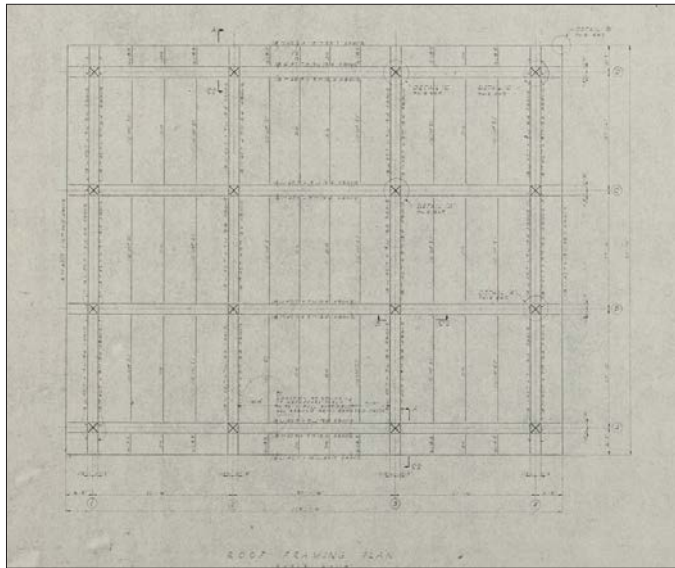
Roof Framing Plan, showing column and grid locations. Date: February 18, 1955. Photo credit: MHG\_Illa\_FF049\_003, Miller House and Garden Collection (M003), Newfields Archives
